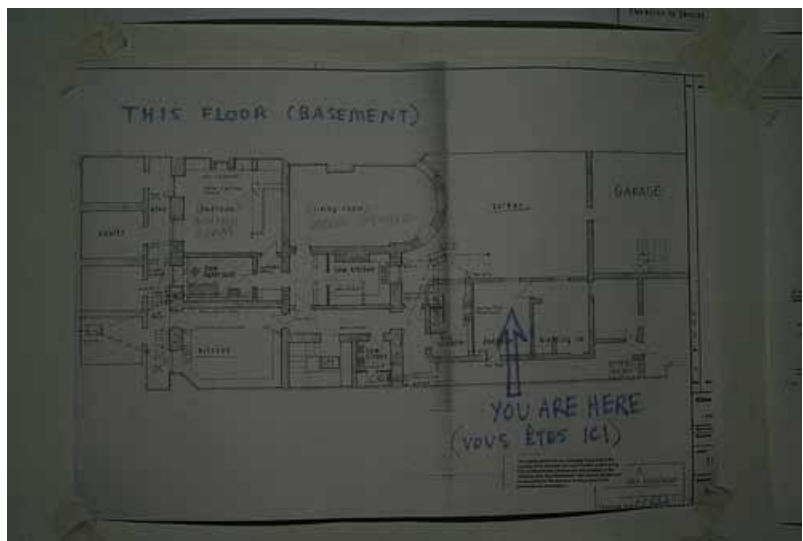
Floor plan of Charles Street. Photo: Amanda Farah
